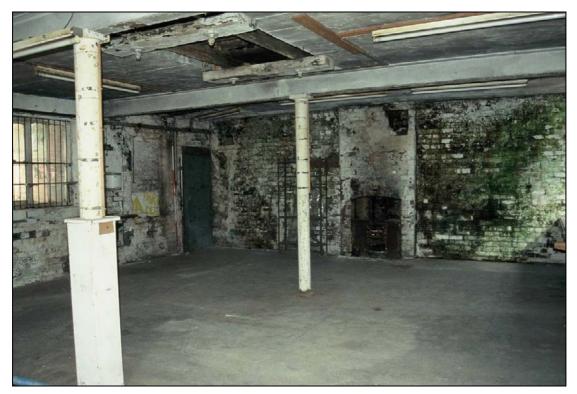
General view of F4, north range – note blocked window, stair scar and fireplace (film C/S 2.10)
